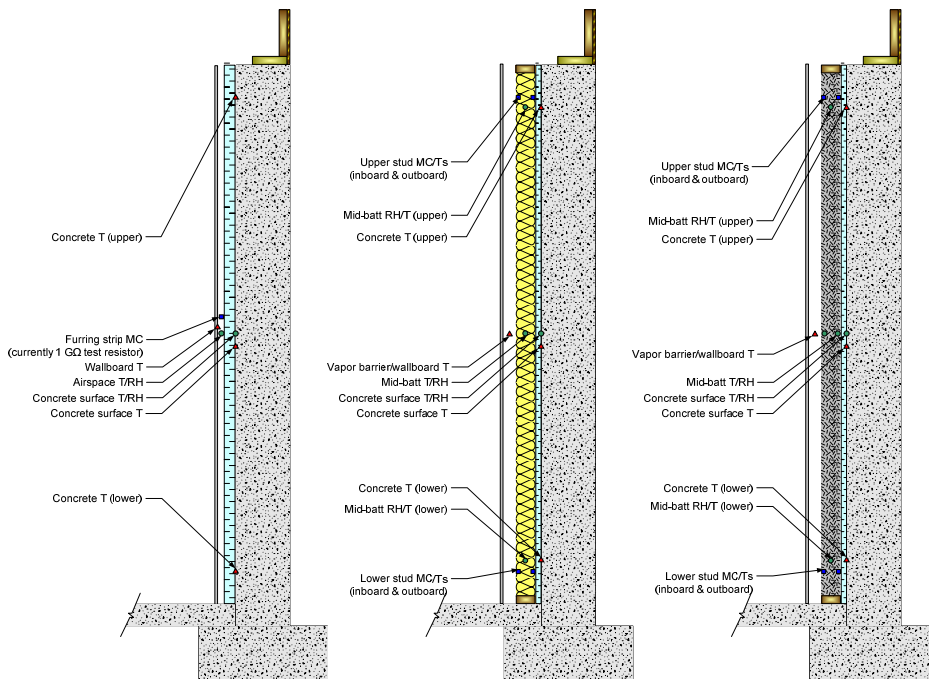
Section and sensor layout for Huntley site walls 4, 5, and 6
